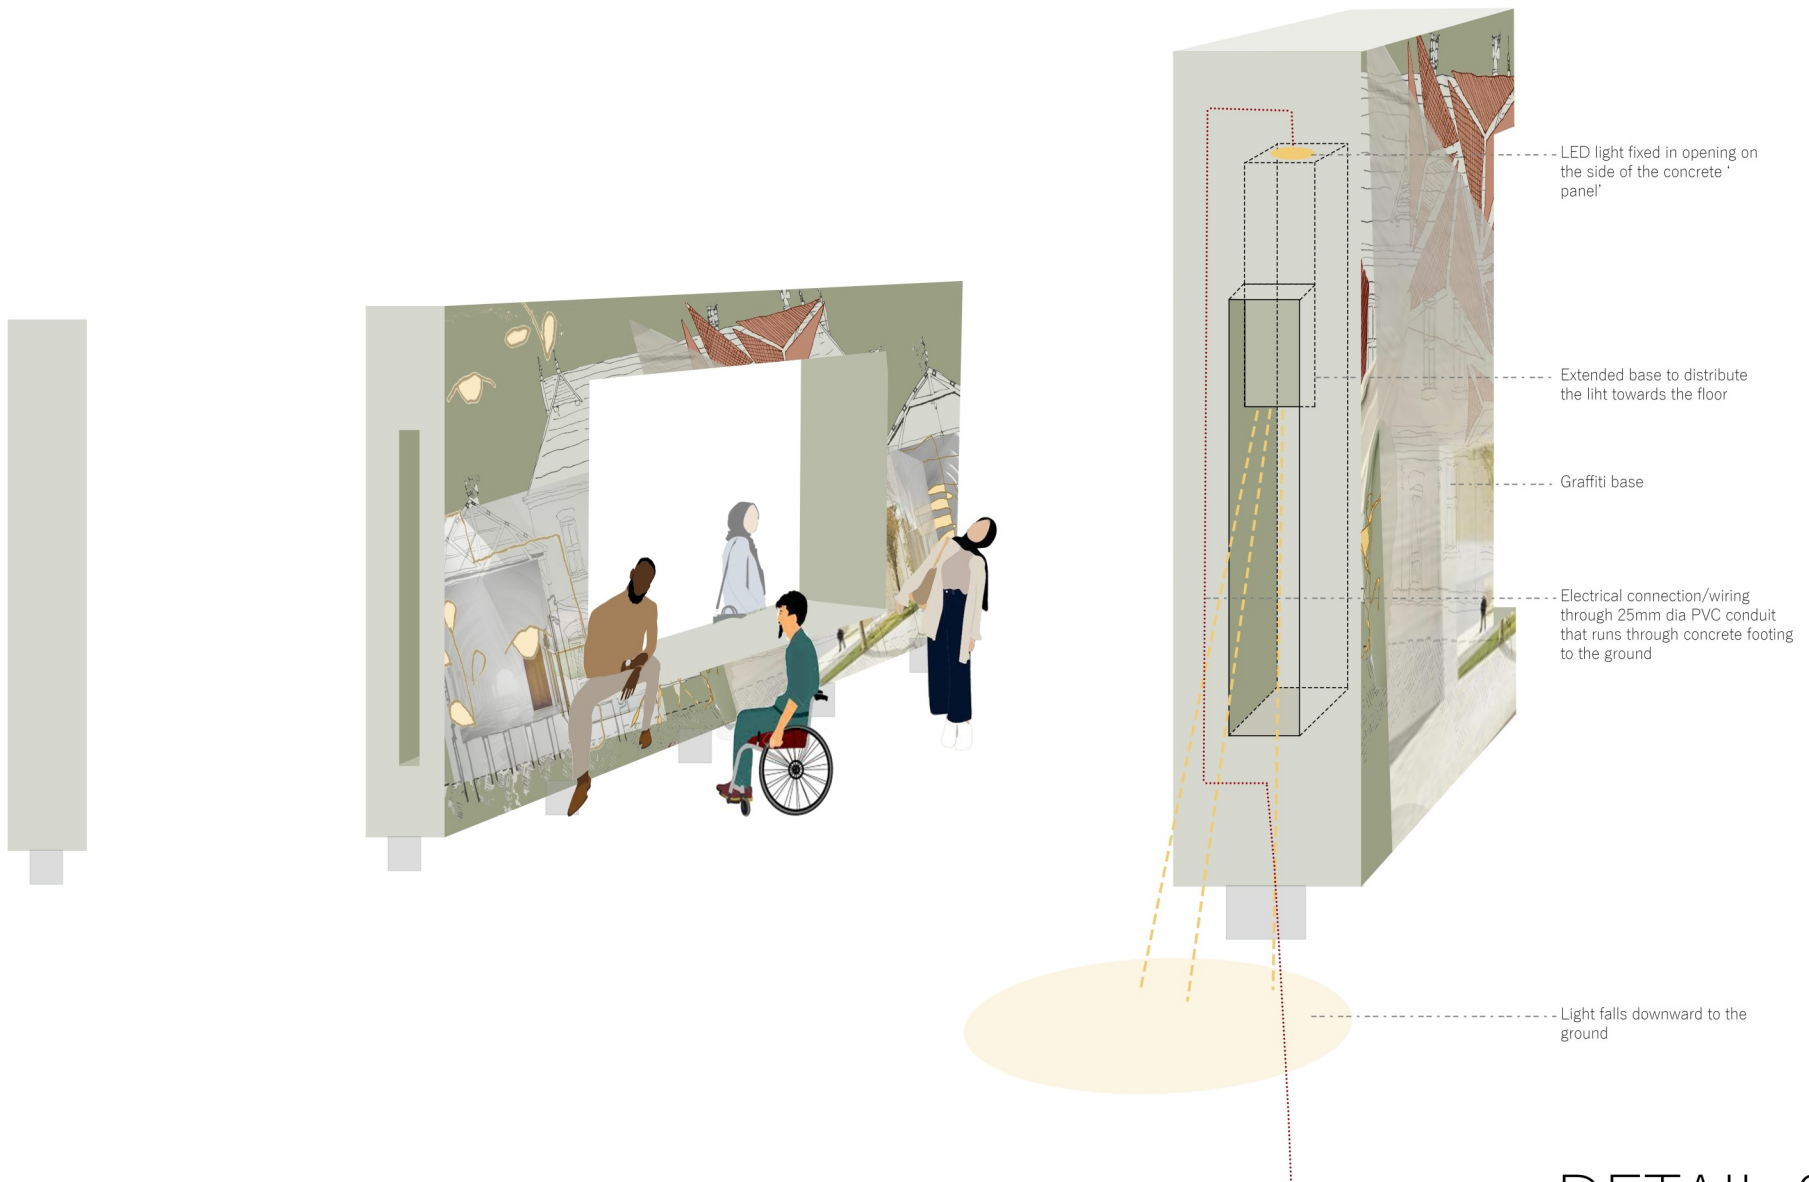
Proposed Detail 02 (Author 2020)
